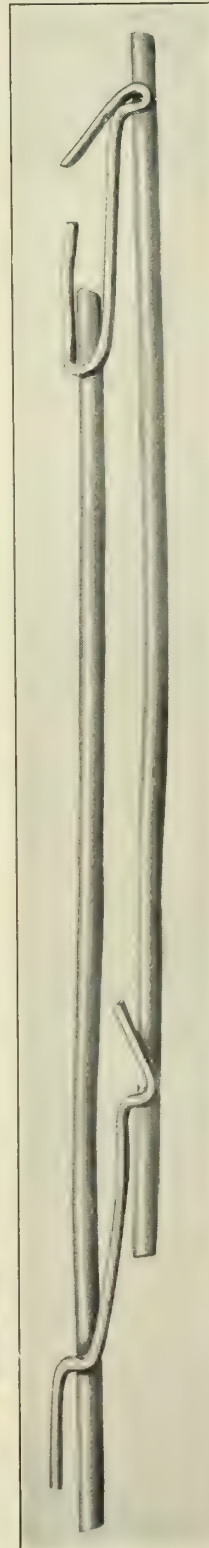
ELECTRICALLY WELDED FABRIC.
